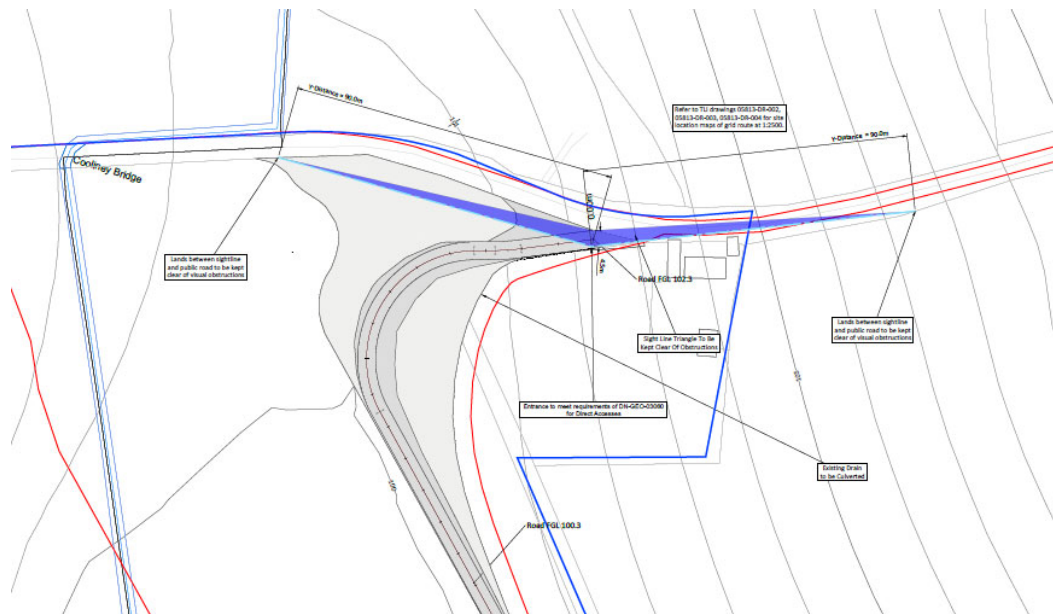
Excerpt of Drawing P2359-0103-0011 Rev B showing 90m sight line to the edge of public road.
